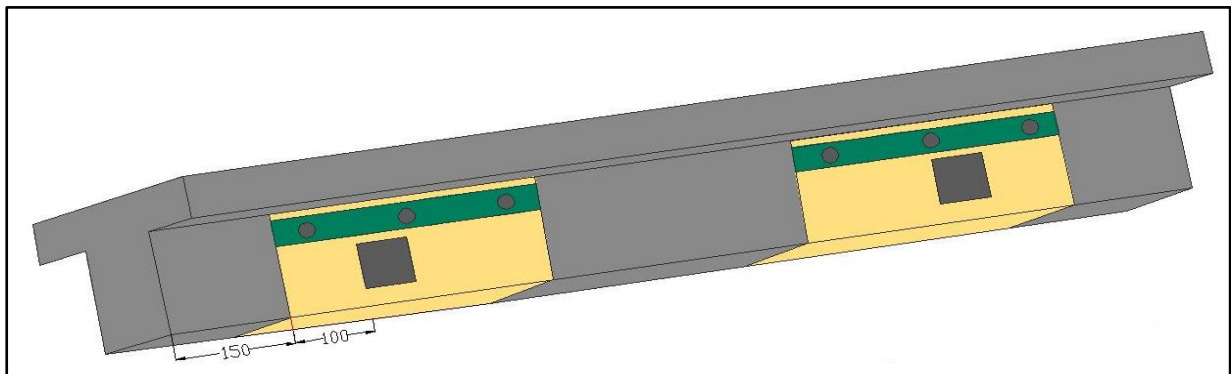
Model of beam with 4 layers of BFRP U-wrap in  $90^0$  orientation with square web openings and anchorage system (SB18)
